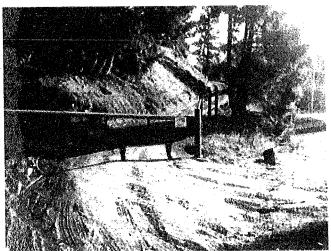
Photograph showing the start of Access Road 3 (Private Access) where it intersects with Road 2 (Old Highway 299). The access to Road 3 has good visibility, is dirt and is approximately 12-14 ft, wide with slopes of 5-10%.
